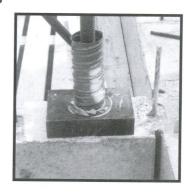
Load Bearing Wall-Load Bearing Wall, Tensile Joints
